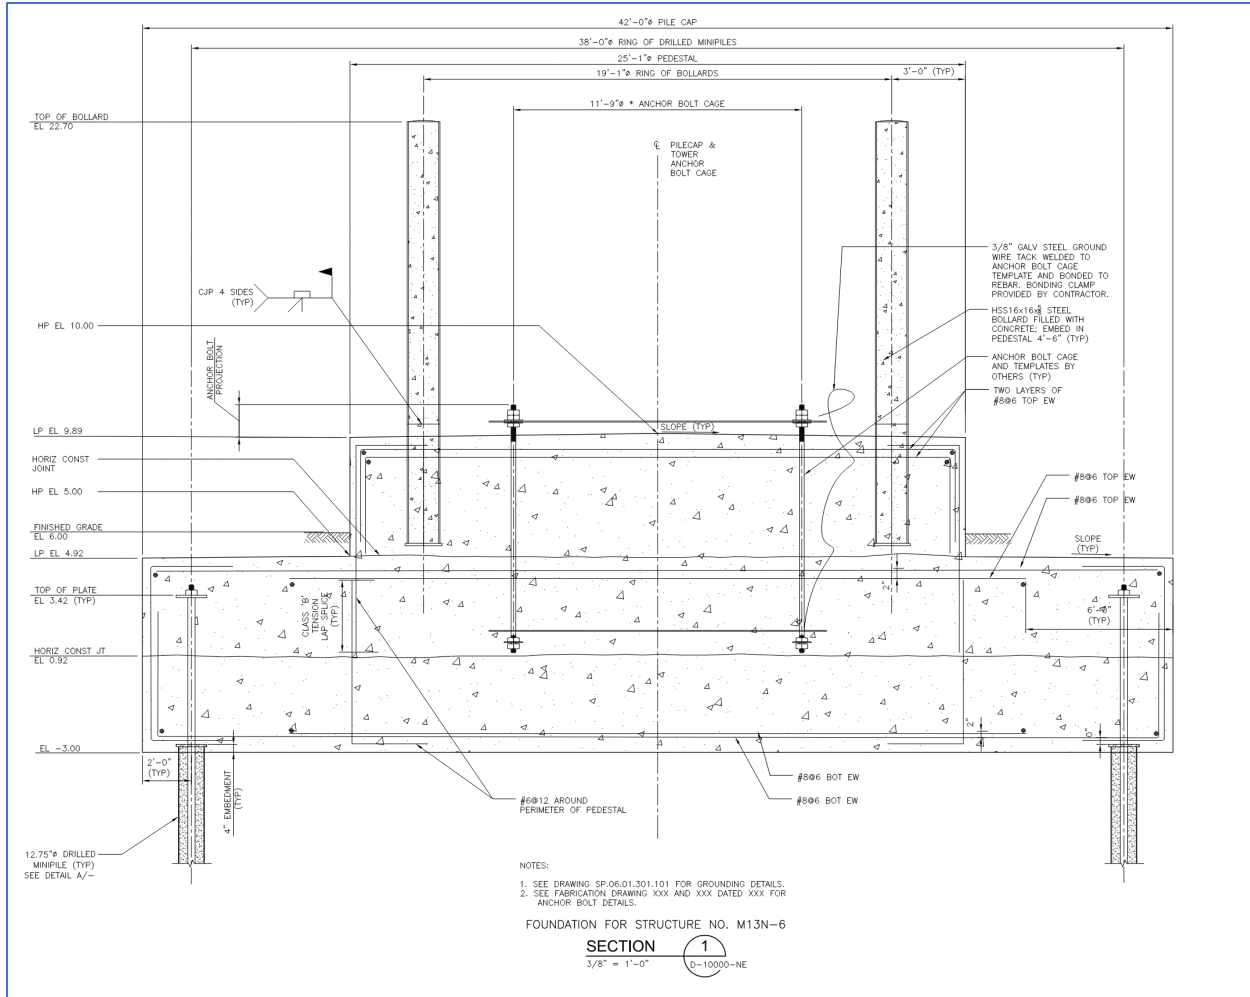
PROPOSED STRUCTURE M13N-6 FOUNDATION CROSS-SECTION
